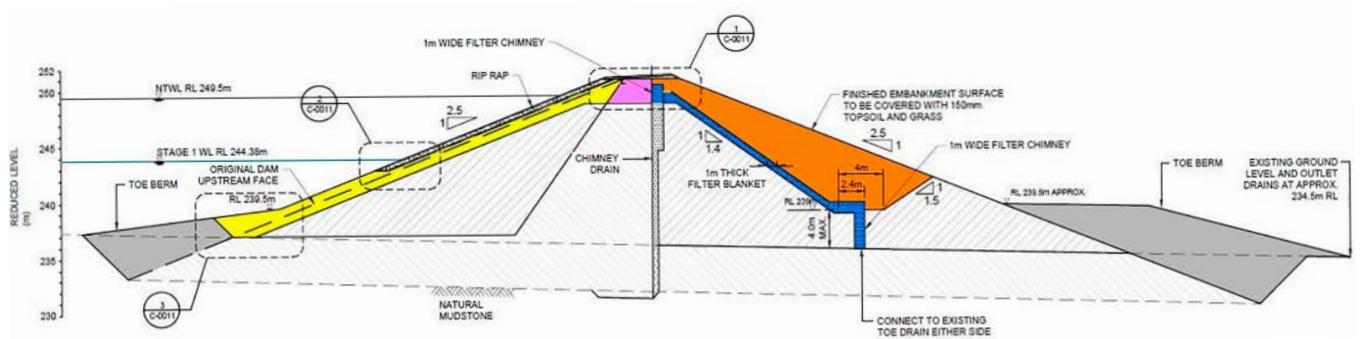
Typical Embankment Profile Following Stage 2 Remedial Works
